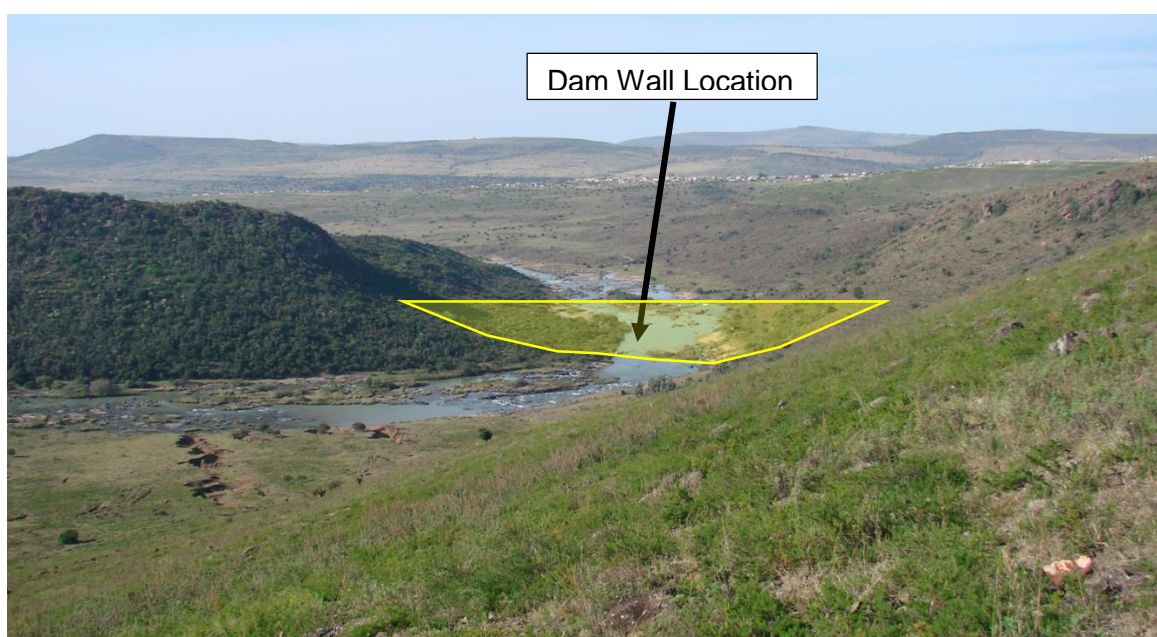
Proposed Lalini Dam Site Looking Downstream
